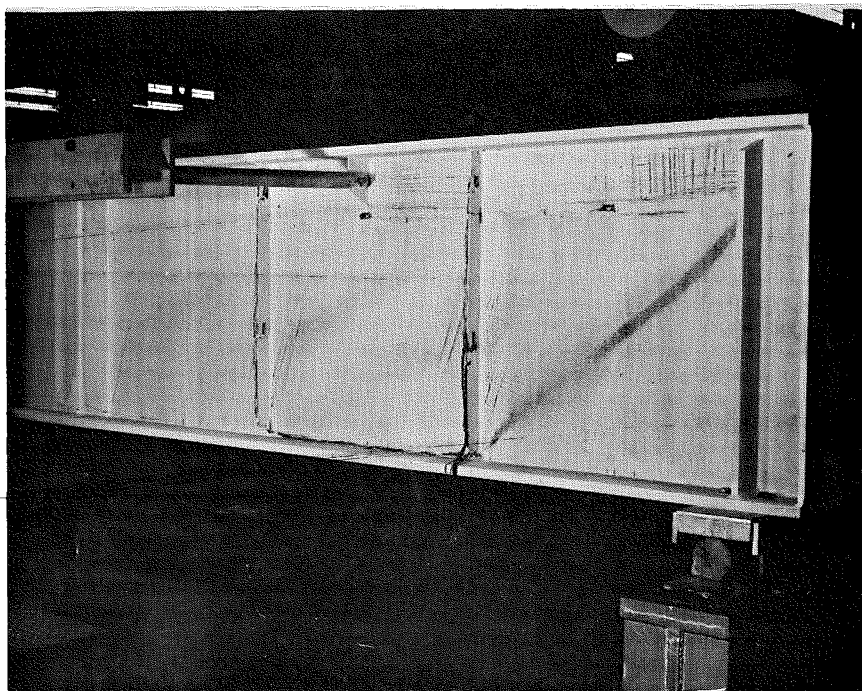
Yield Patterns in Girder LS4 at Load No. 18
